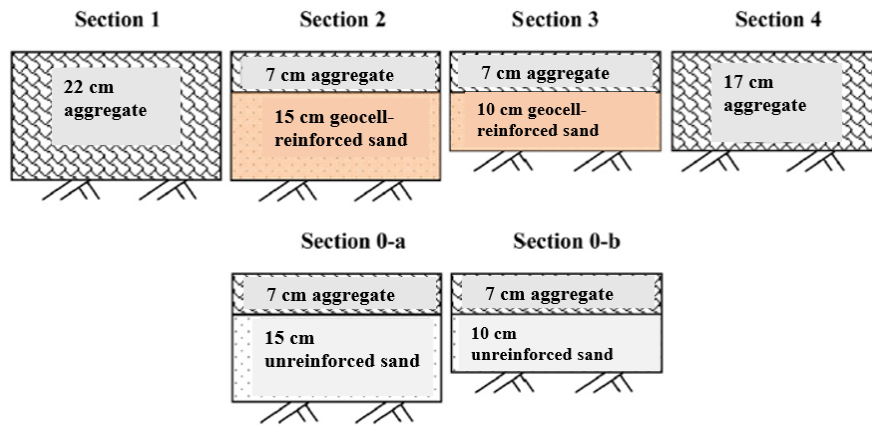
Pavement test section profiles (adapted from Yang et al., 2012).
